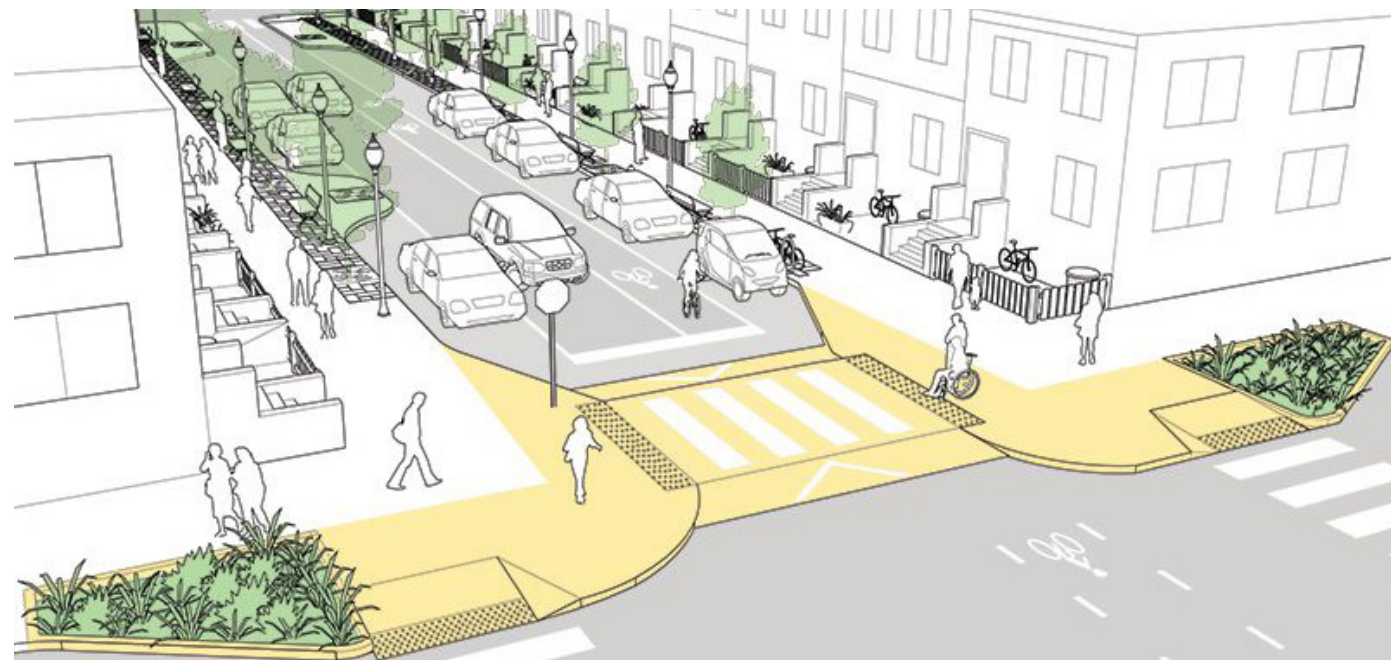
A diagram of the Complete Streets approach as applied to a local neighborhood street, with a 30-foot roadway within a 50-foot right-of-way. Local streets should provide safe, accessible, inviting ways to travel around the community. Source: National Association of City Transportation Officials (NACTO)
